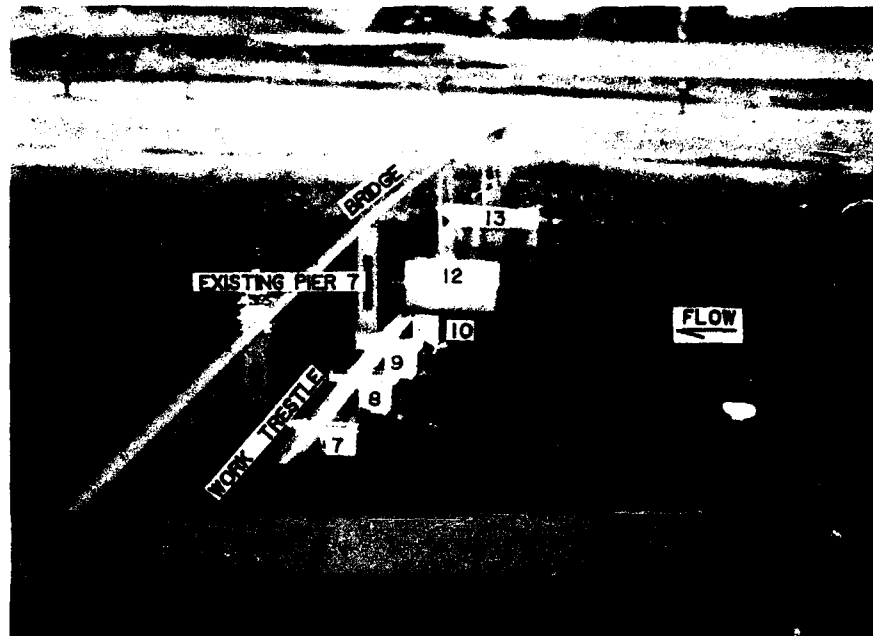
The model at the beginning of Test 1 looking west toward Missouri (12 February 1979). Note work trestle to past pier 10, cofferdams at piers 7-10, 12, and 13, piles for craneway at pier 10, and old Jefferson Barracks Bridge
